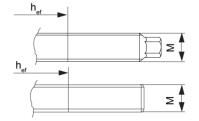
FIS SB ANCHORING SYSTEM & STEEL ELEMENTS
